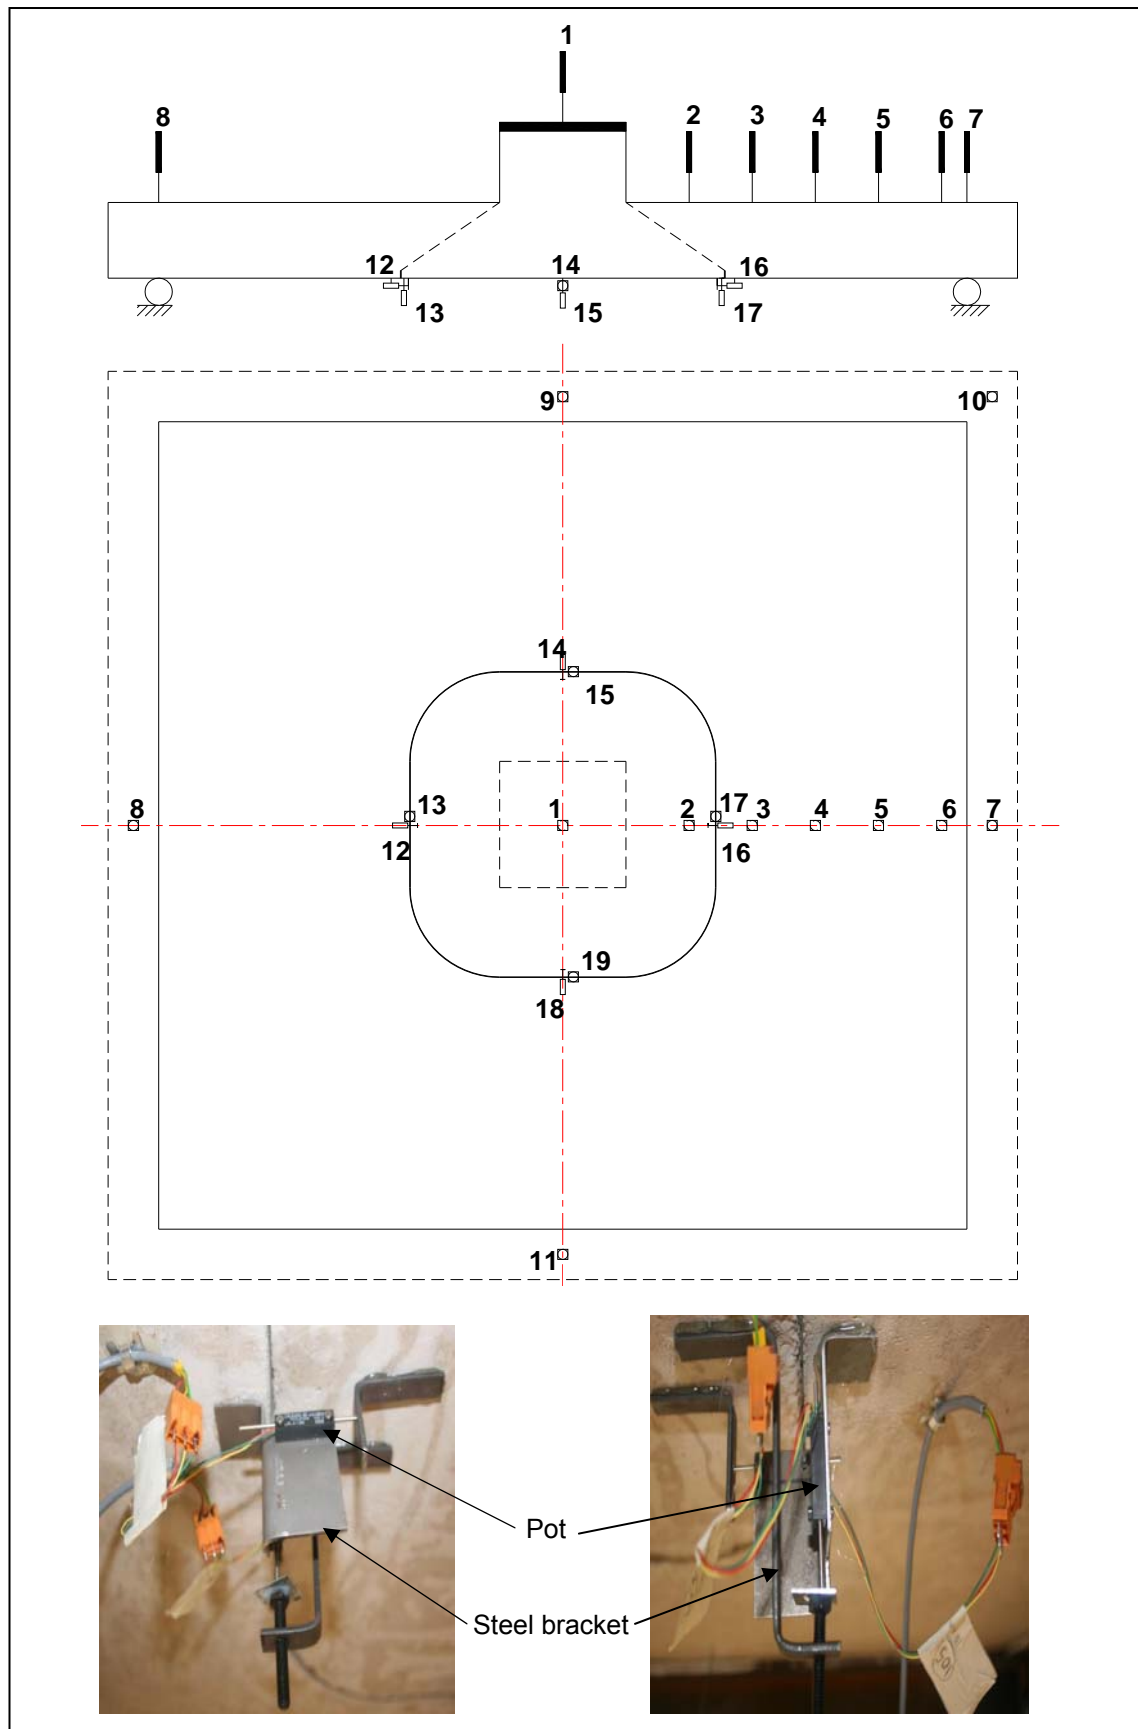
Arrangement of pots over specimen and around induced crack.
